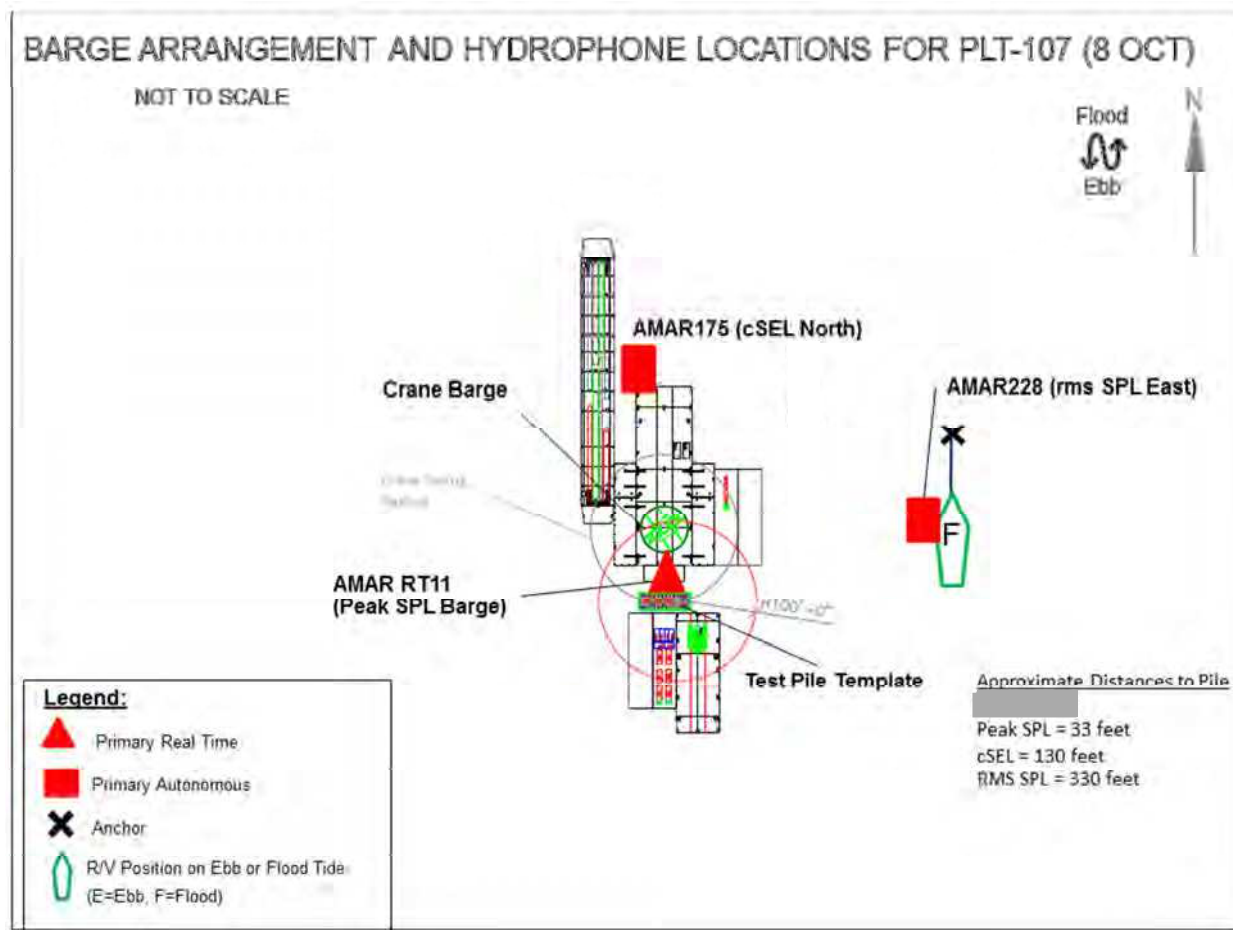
Plan view of pile and barge layout, 08 October 2013, Test Pile PLT-107.
